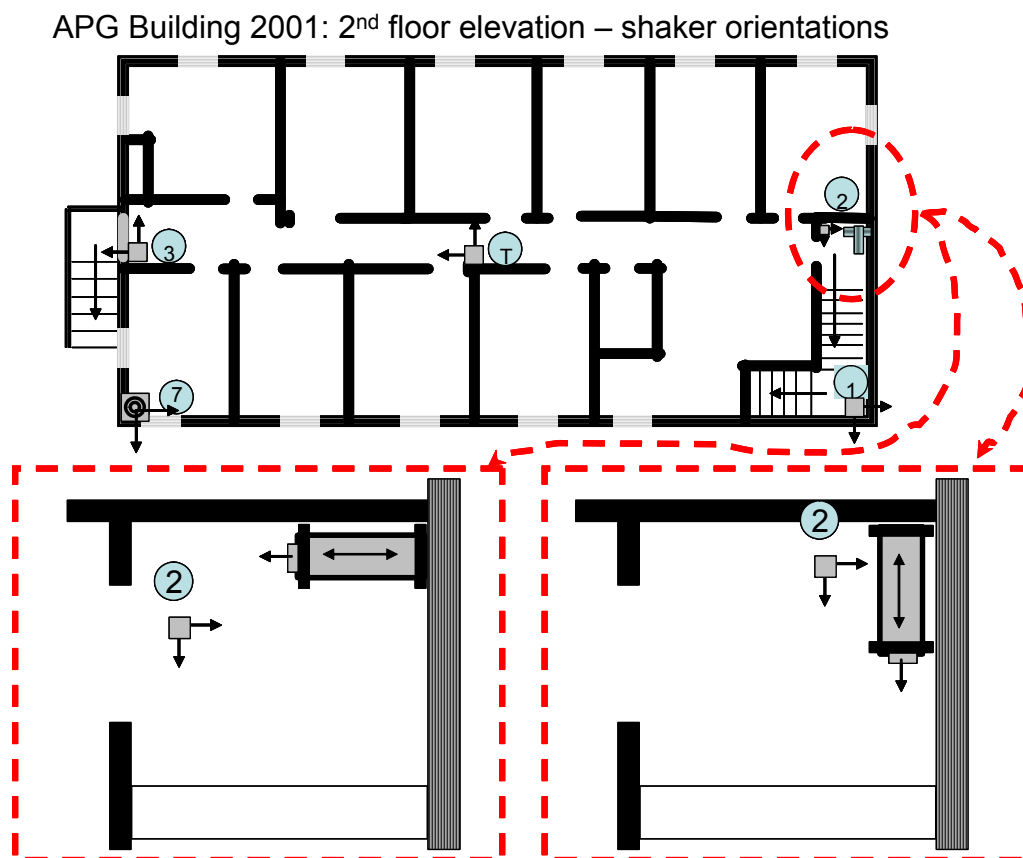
Plan Schematic Showing Shaker Locations on the Second Floor Level
